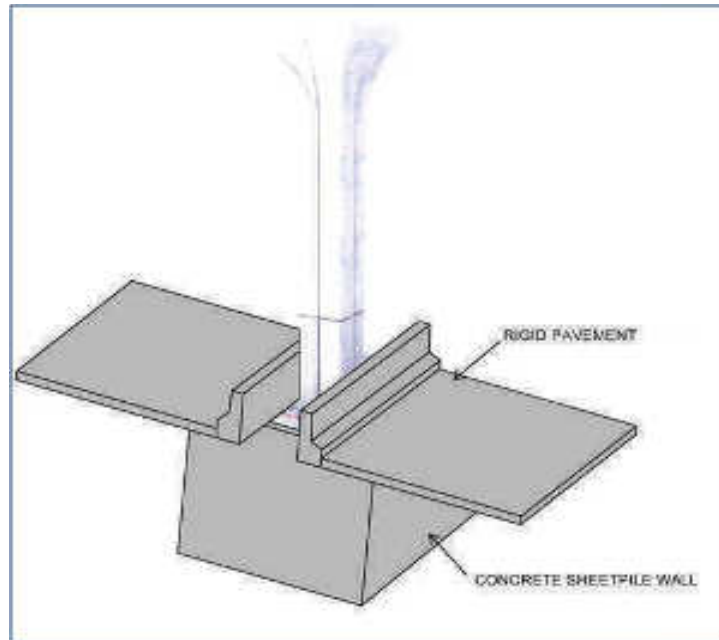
(a) : Transition Structure for Differential Settlement at Pier and Roads Surrounding Pier
